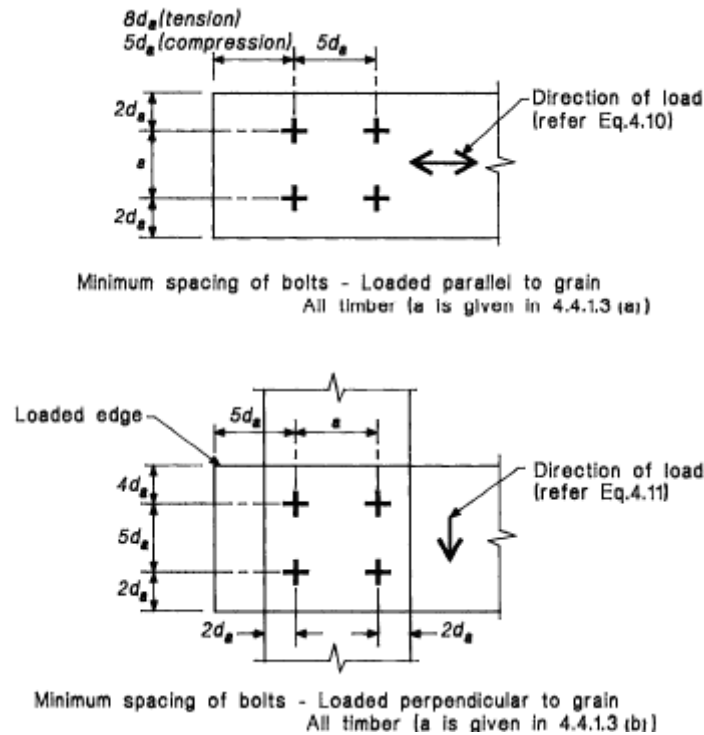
Spacing requirement for bolted connections (NZS 3603 (1994)).
